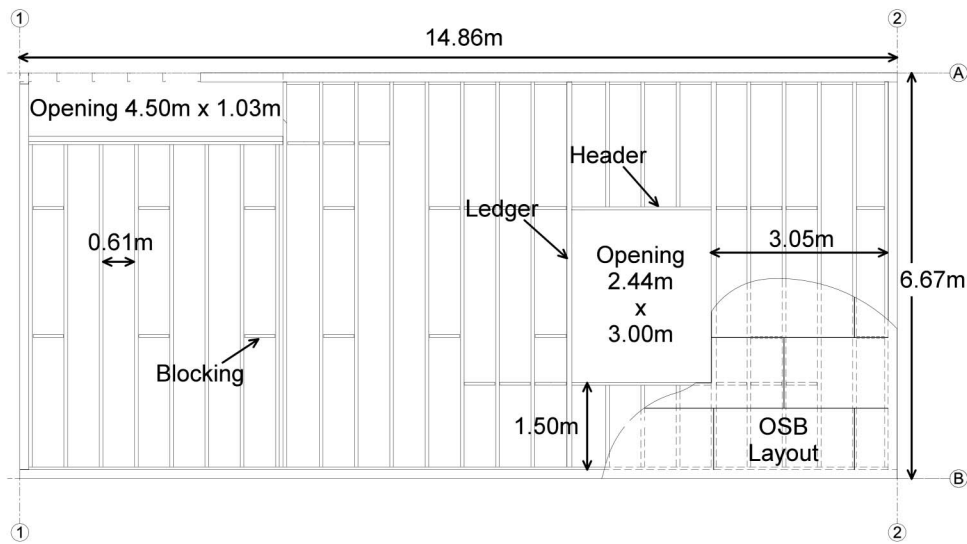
CFS-NEES floor plan showing overall dimensions, joist spacing, ledger/header locations, blocking, and OSB sheathing layout along with openings
